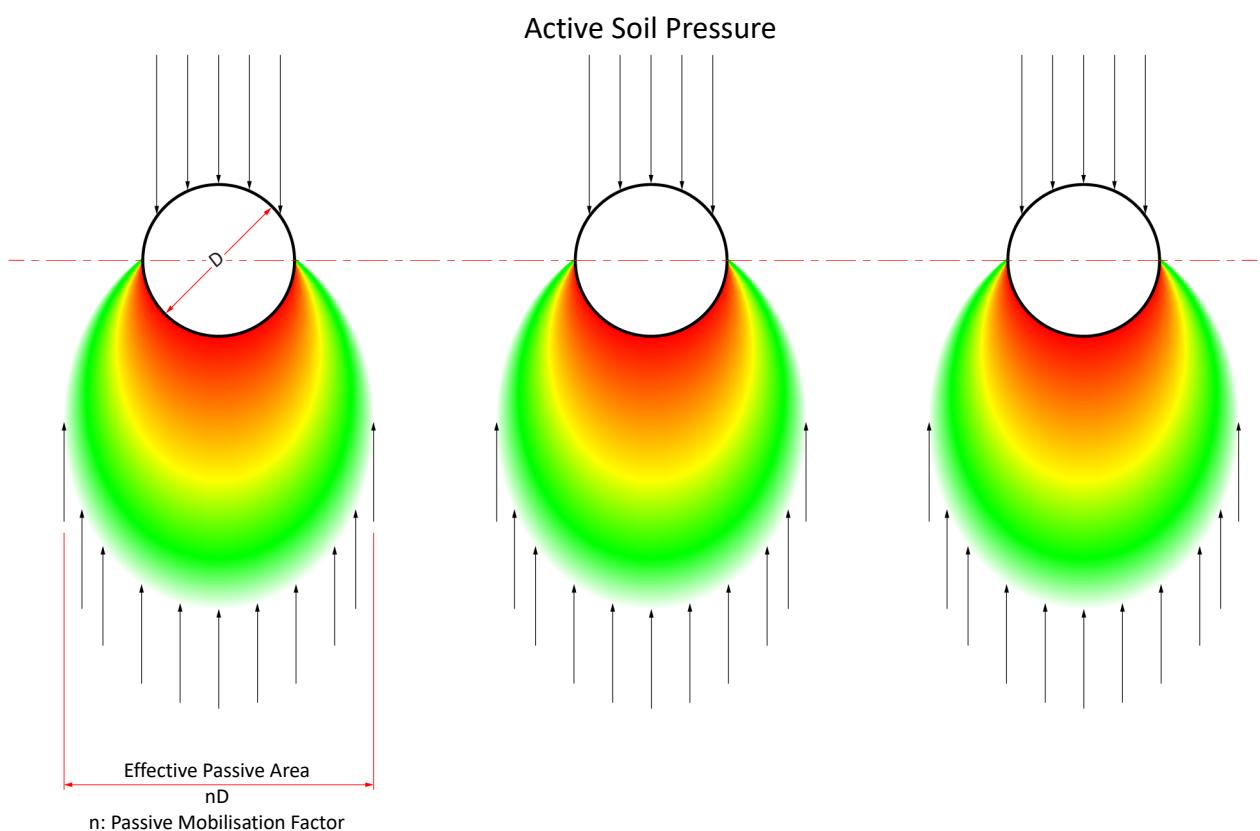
(d). Earth pressure diagram - Plan in section F-F (Pattern B, below SSP toe level)
